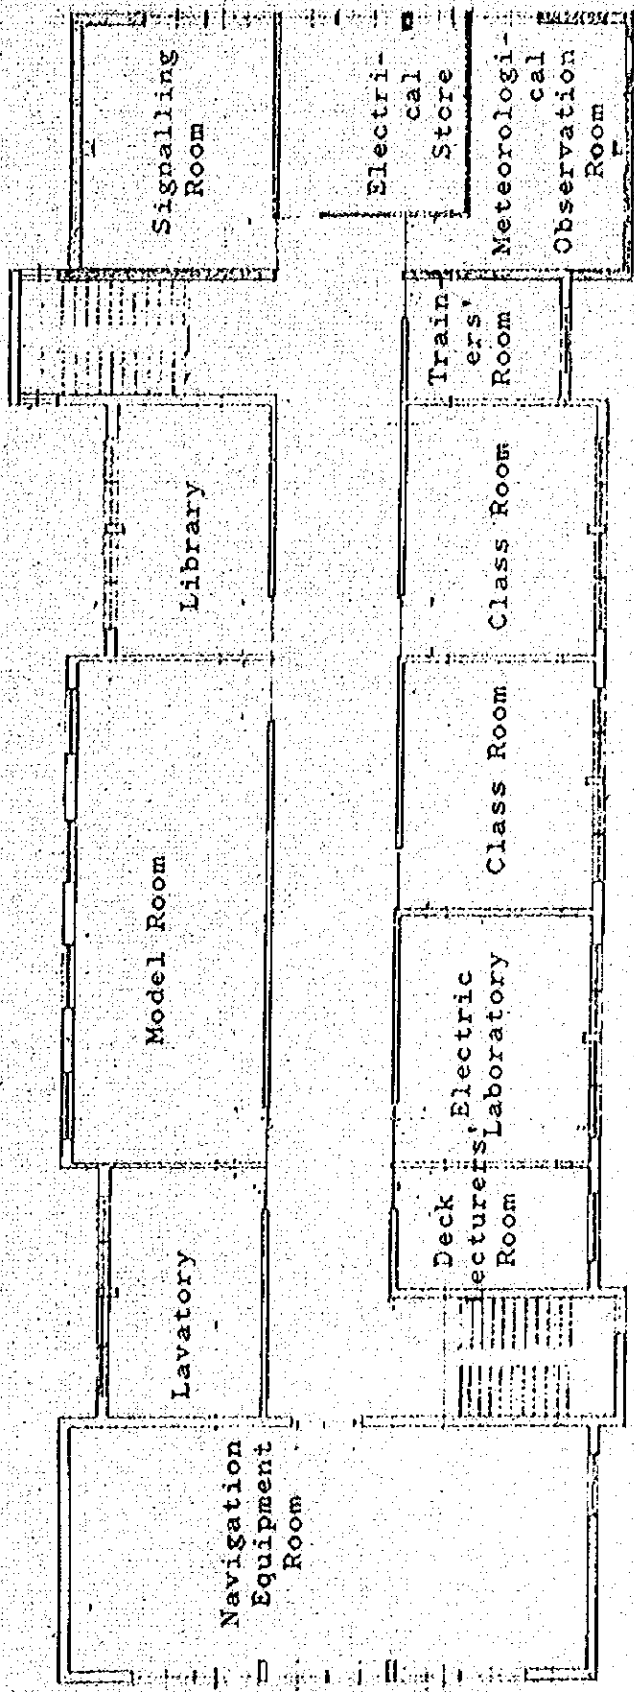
Plan of SSIC Educational Building (2nd Floor)
